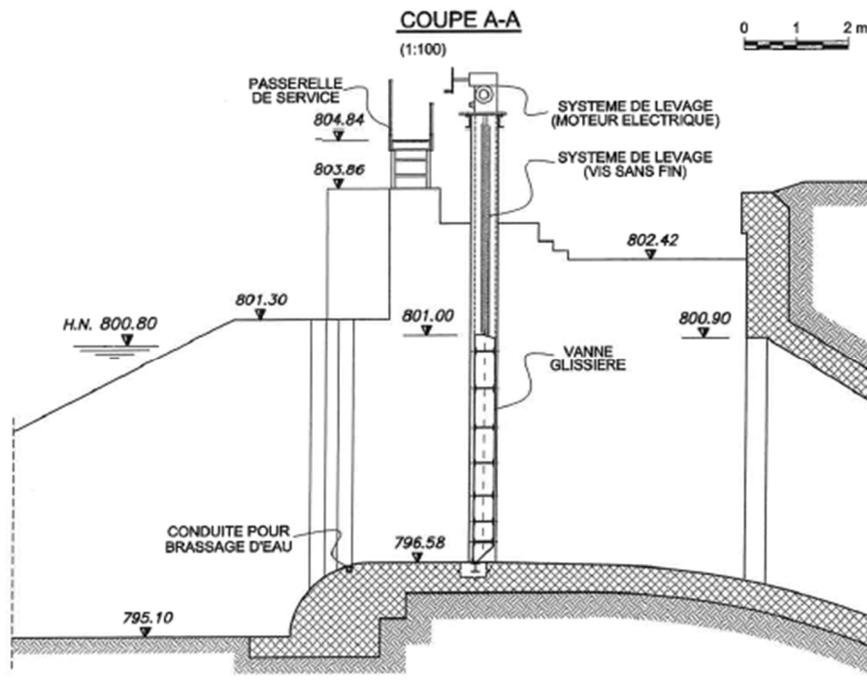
Cross section of bypass tunnel equipped with sliding gates
